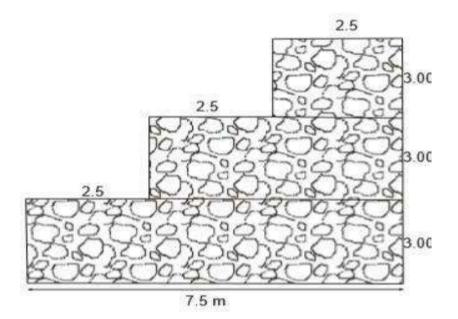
Typical Cross Section of Gabion Structure Provided at Toe
